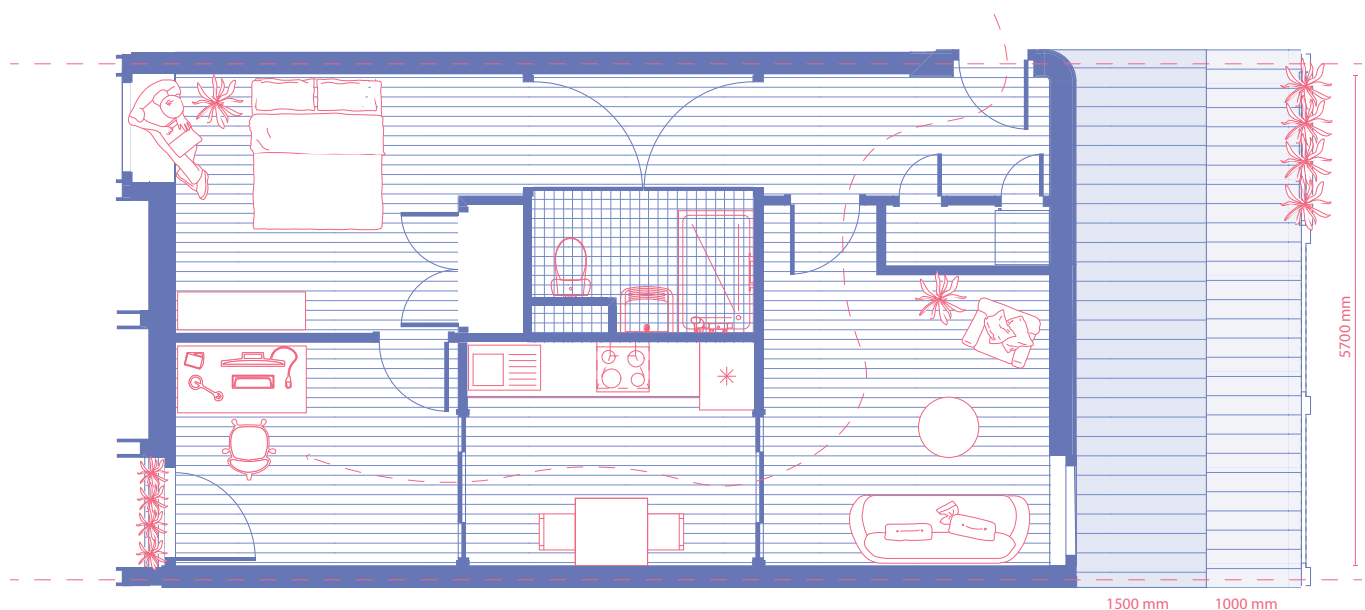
Standard Floorplan, scale 1:50 (scaled to 1:100)
